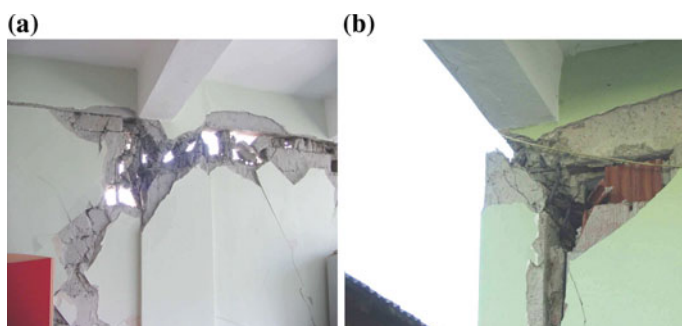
a Shear failure of column; b Shear failure of beam-column joint due to strut action of infill in 2003 Bingöl earthquake [5]
